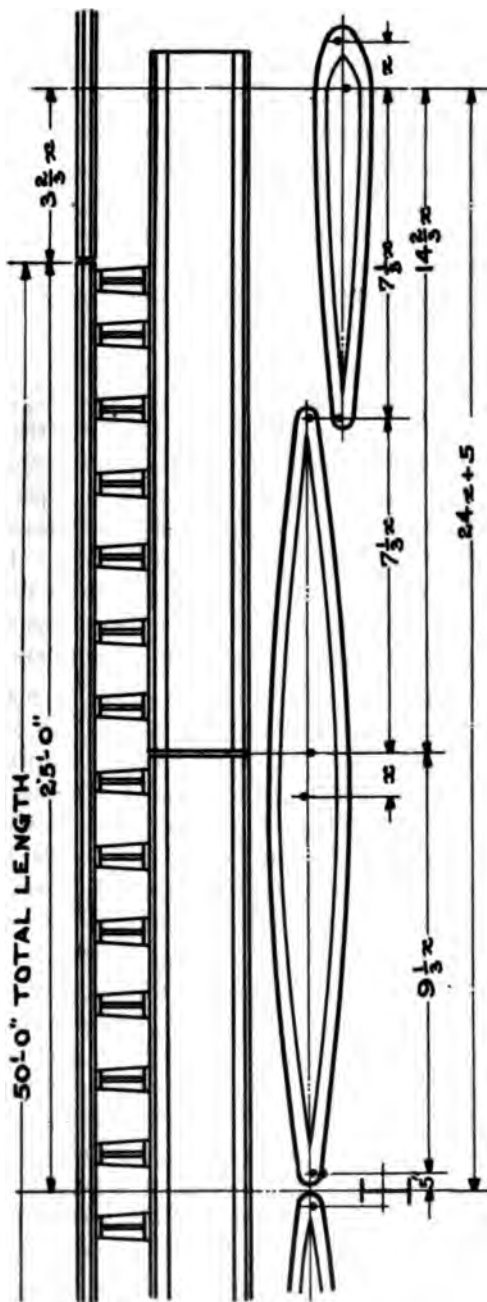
DIAGRAM SHOWING DIMENSIONS OF PLATFORM, GIRDERS AND LEVERS
